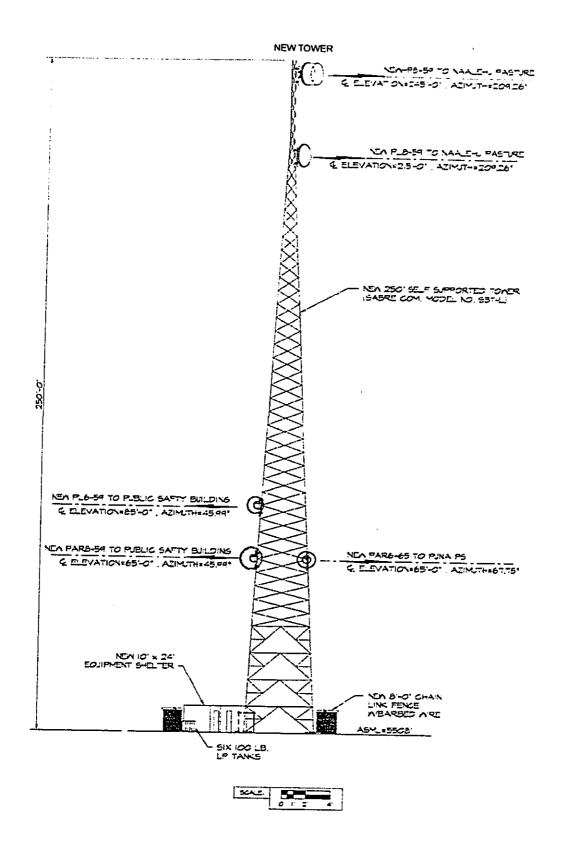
E Kulani Cone / Elevation Plan (looking east)
